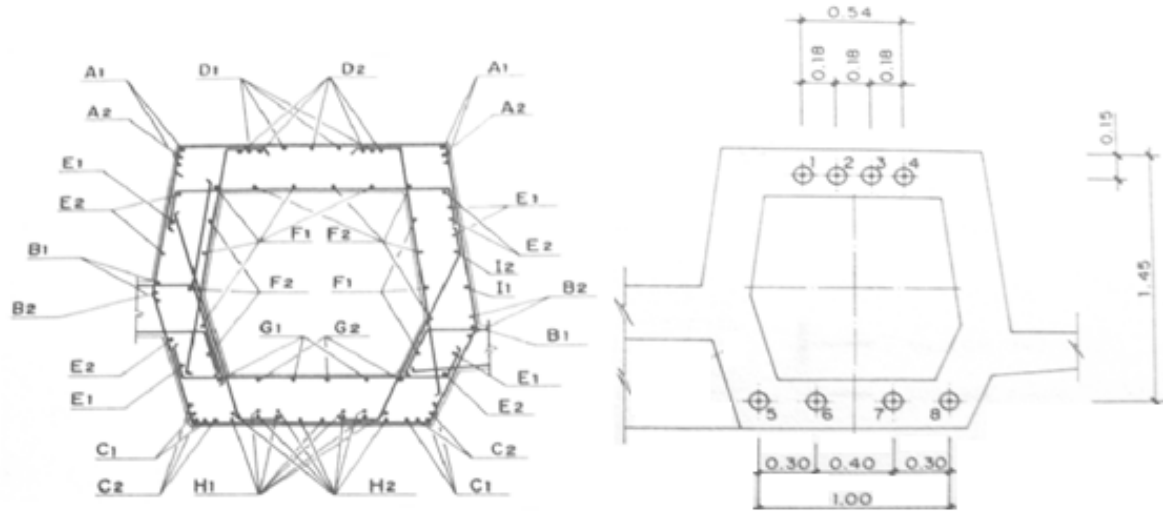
Longitudinal beams cross-section: a) passive reinforcement and b) pre-stressed reinforcement
